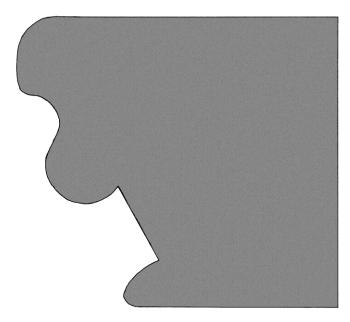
Cross section of upper floor joist 9. Height of 135mm, maximum width 150mm. The moulding has some affinity with the stonework which probably came from the hall windows (section 4.2).
